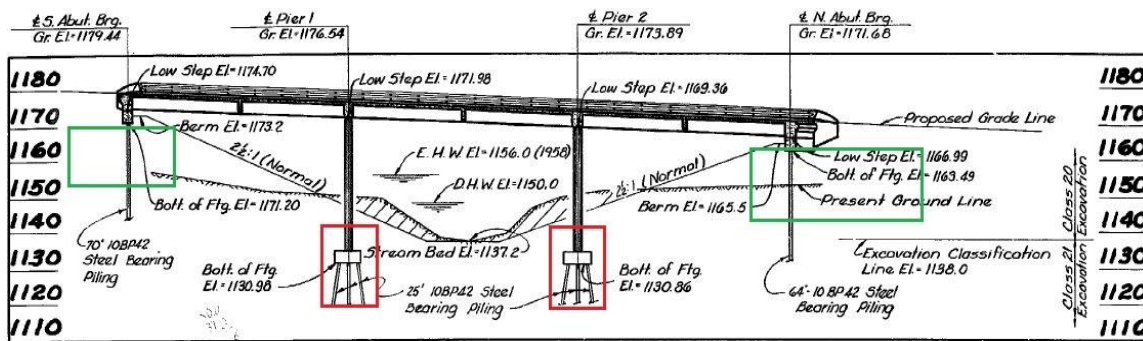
Longitudinal section of a bridge with an unknown scour depth
